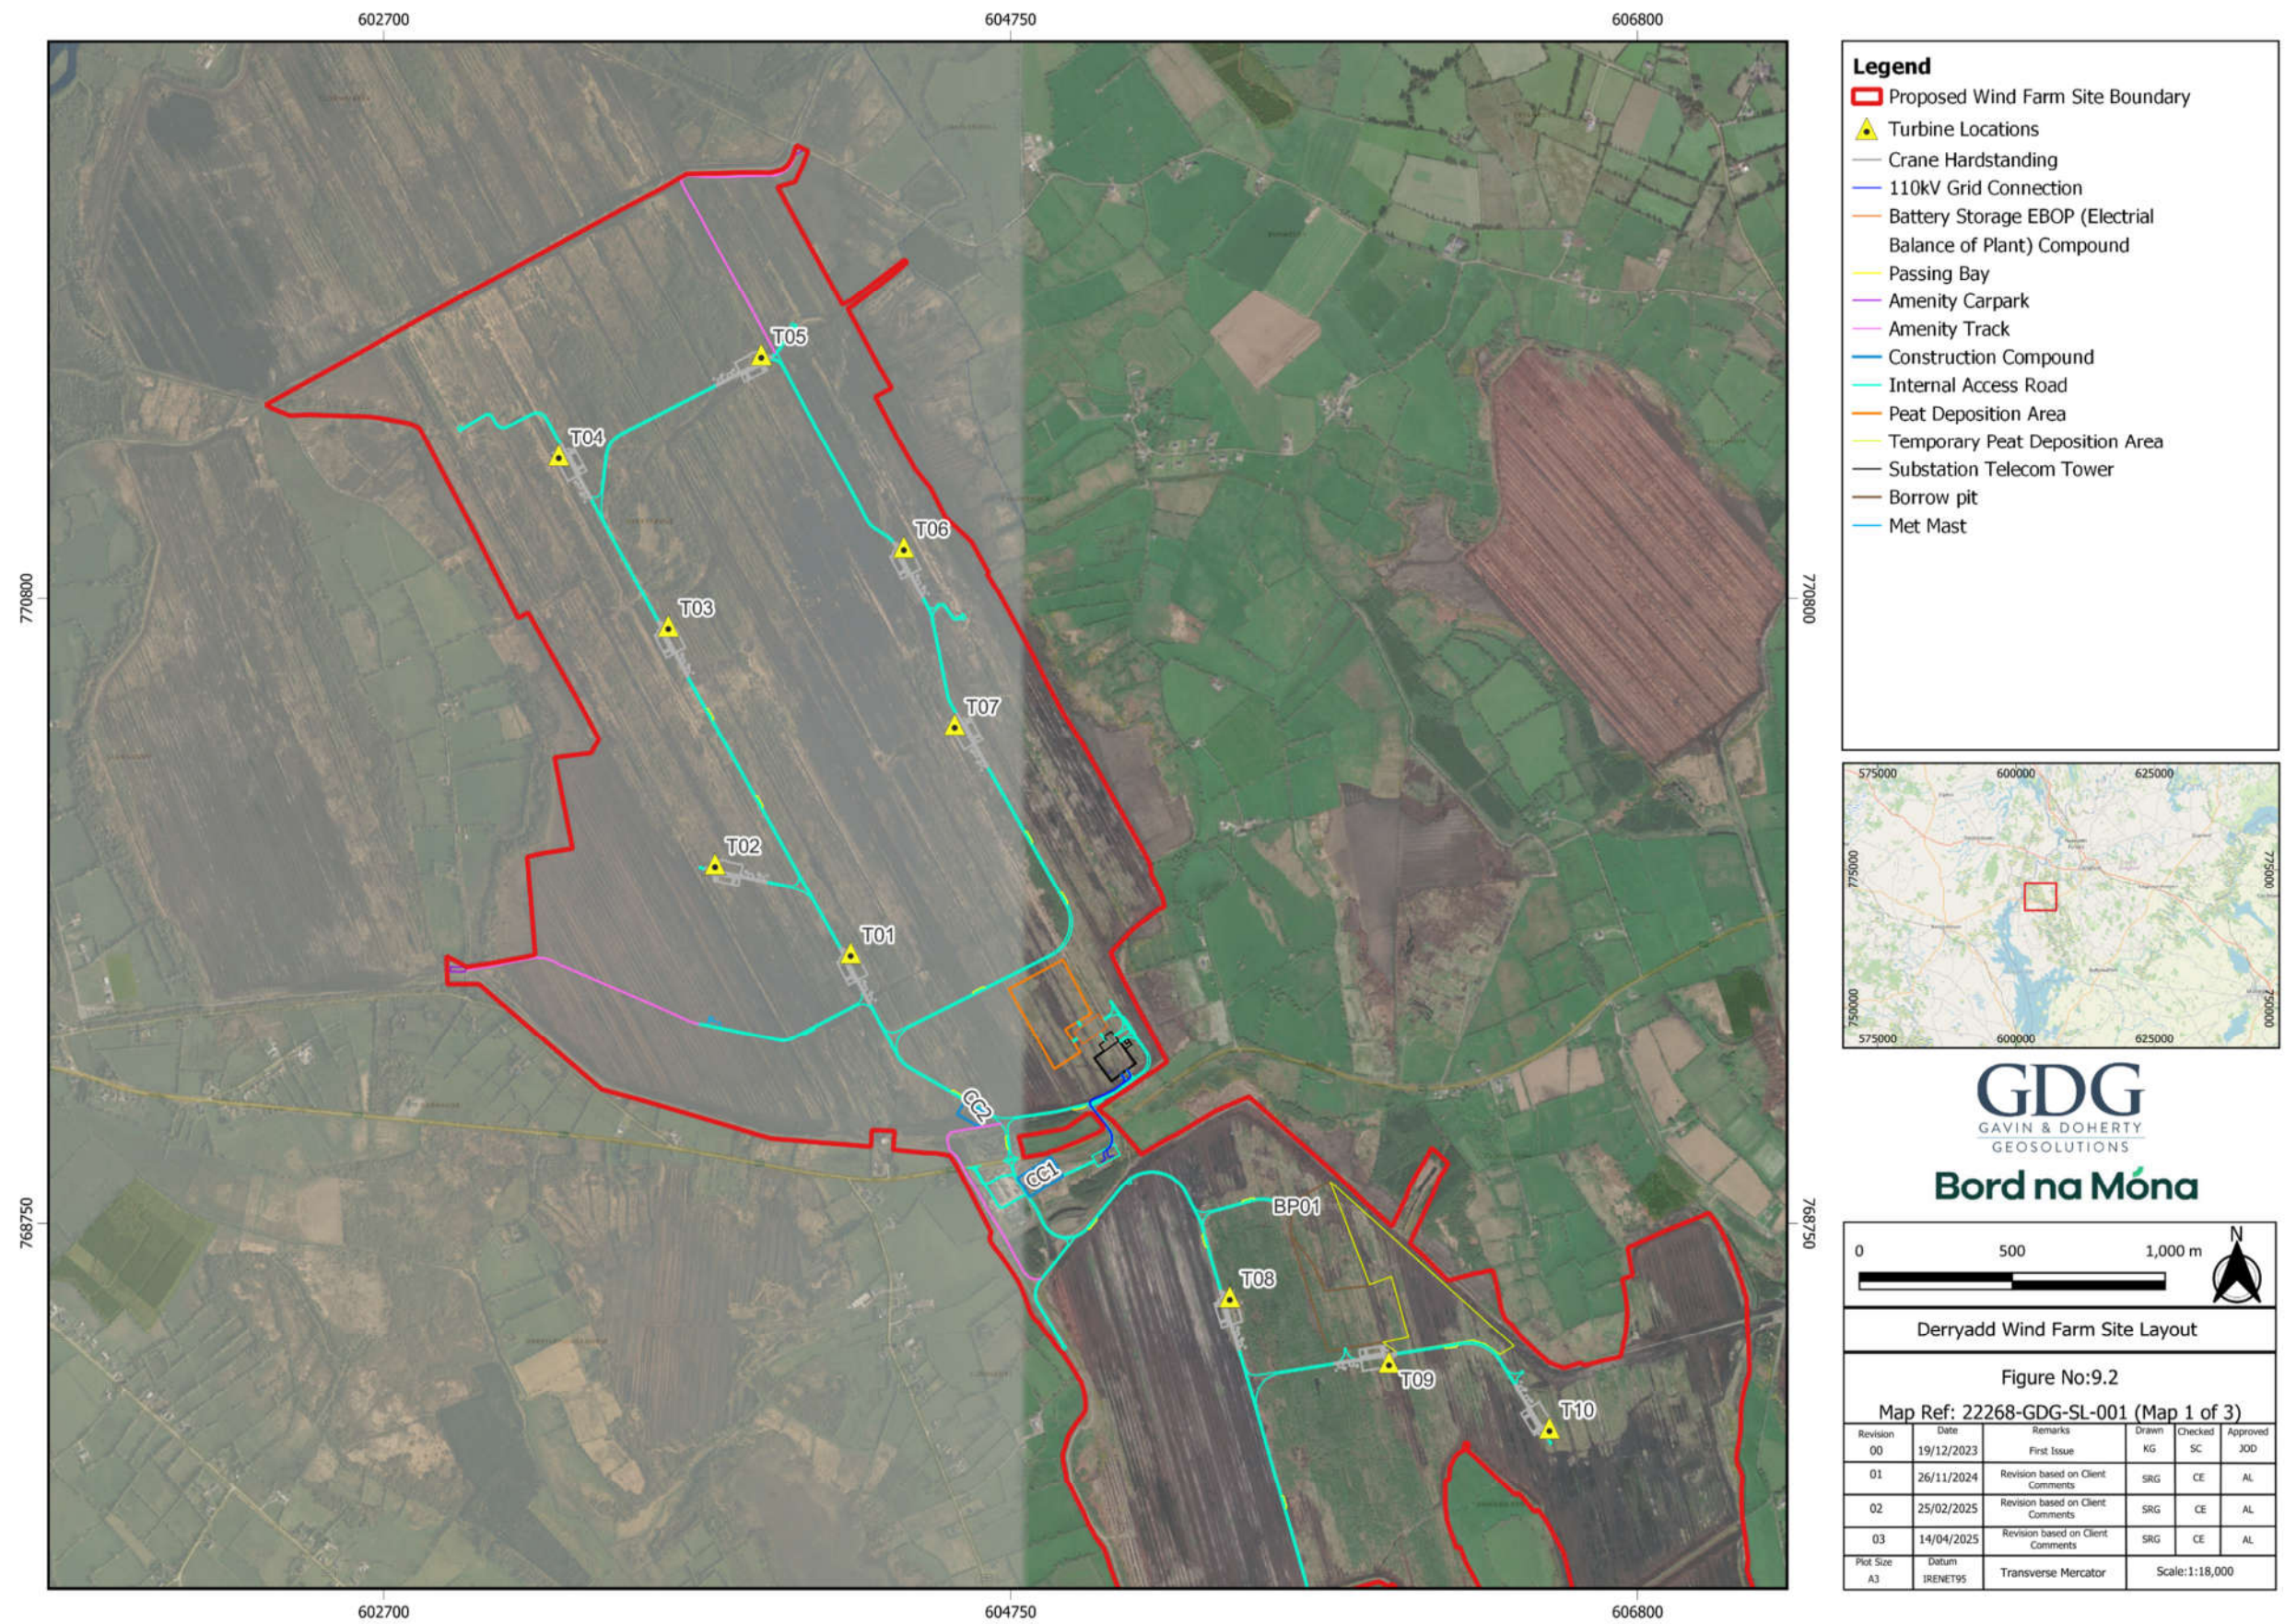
Derryadd Wind farm site layout (Map 1 of 3)
